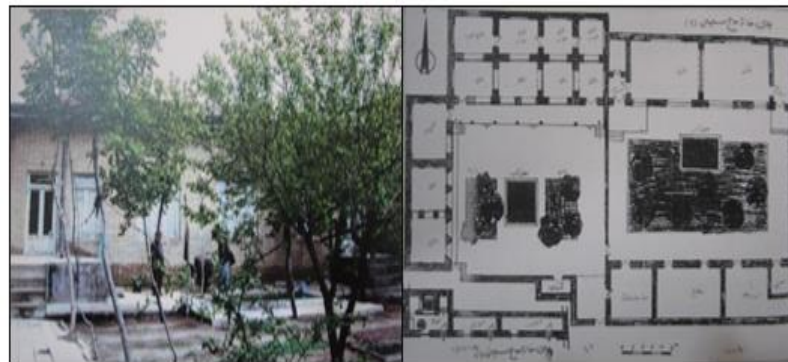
Plan and view of Haj Soleimani house in Zanjan (related to the Pahlavi period) (Source: Zanjan Cultural Heritage Archive, 2007)
